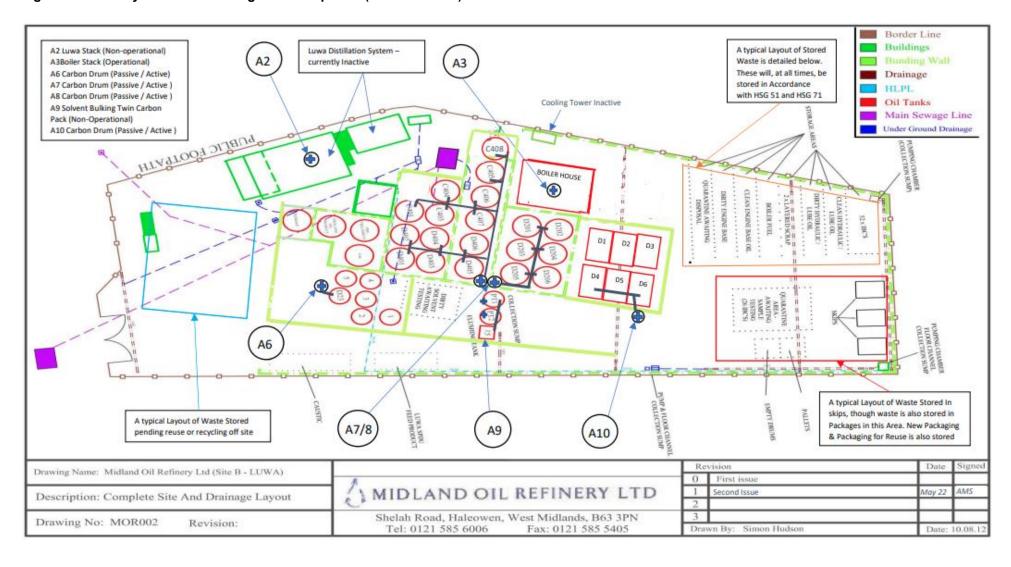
Site Layout Plan including emission points (Site B –LUWA)
